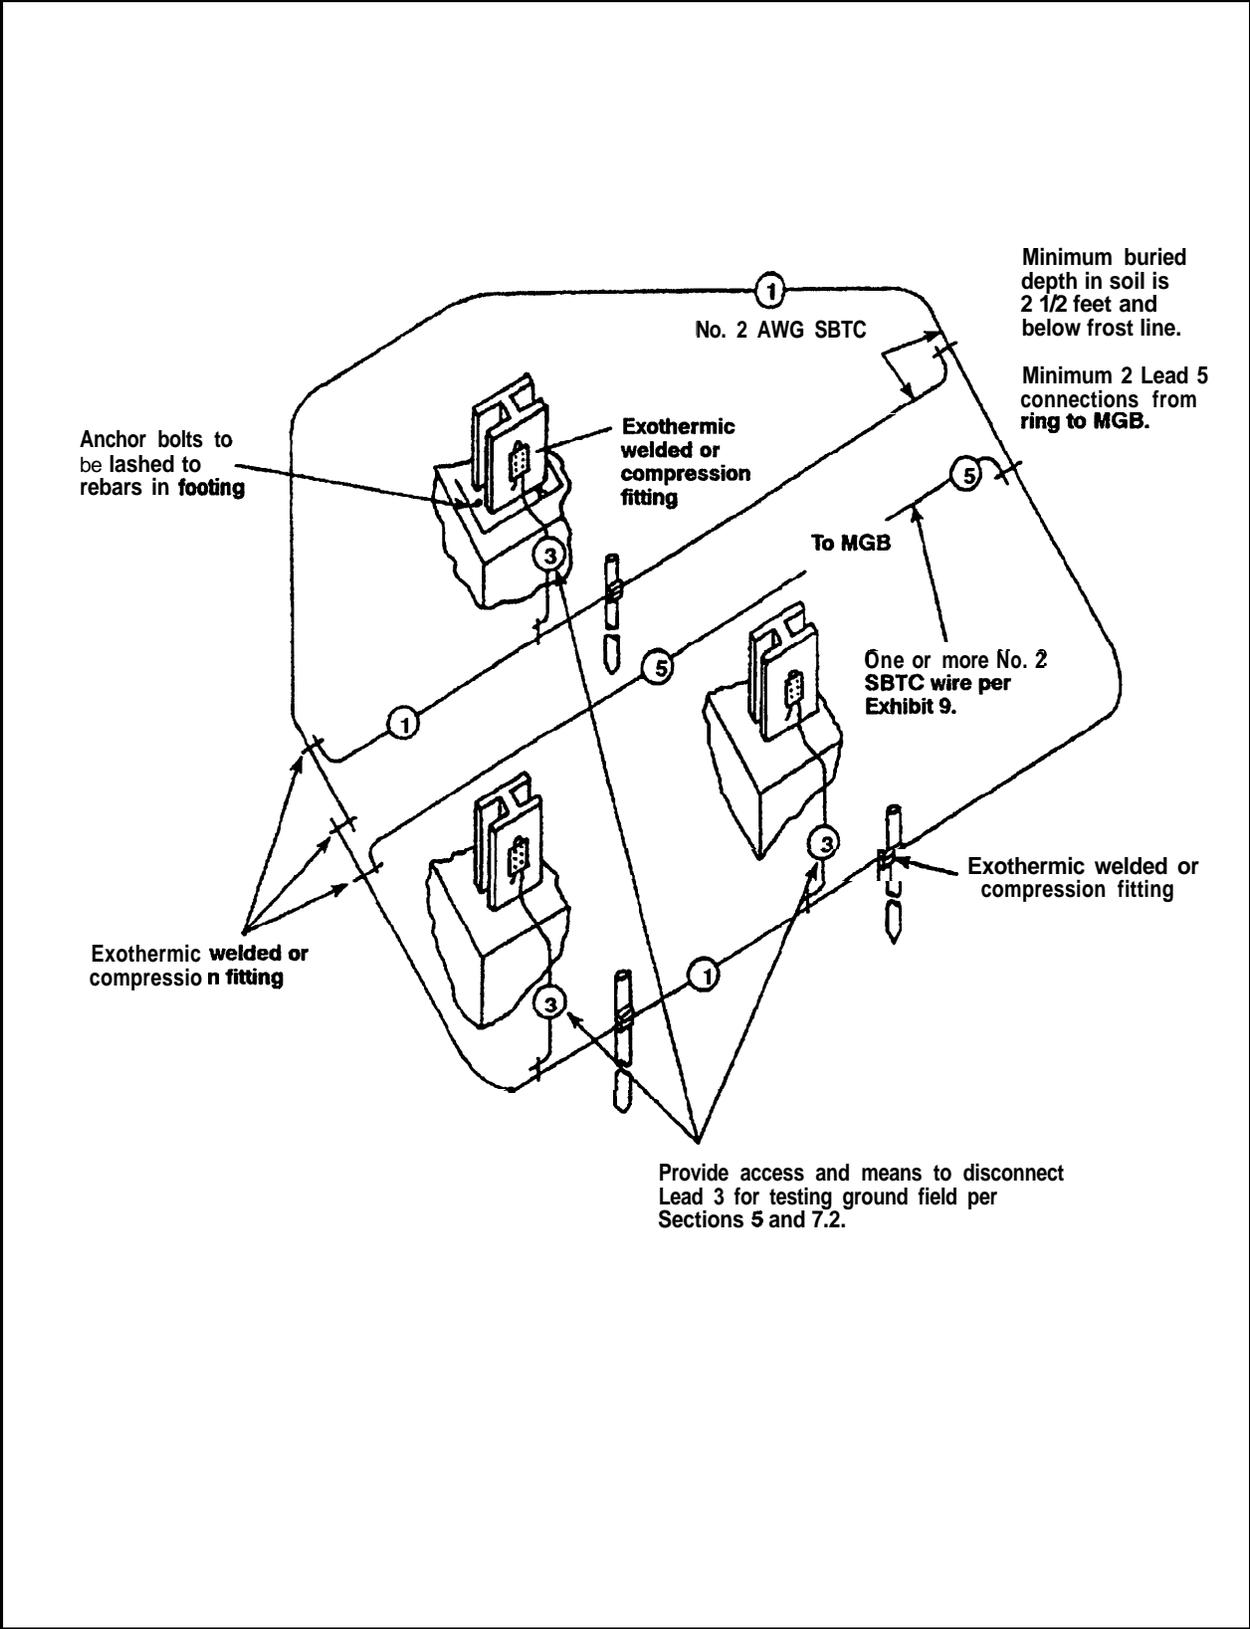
Typical Ground Field-New Structural Steel Building
